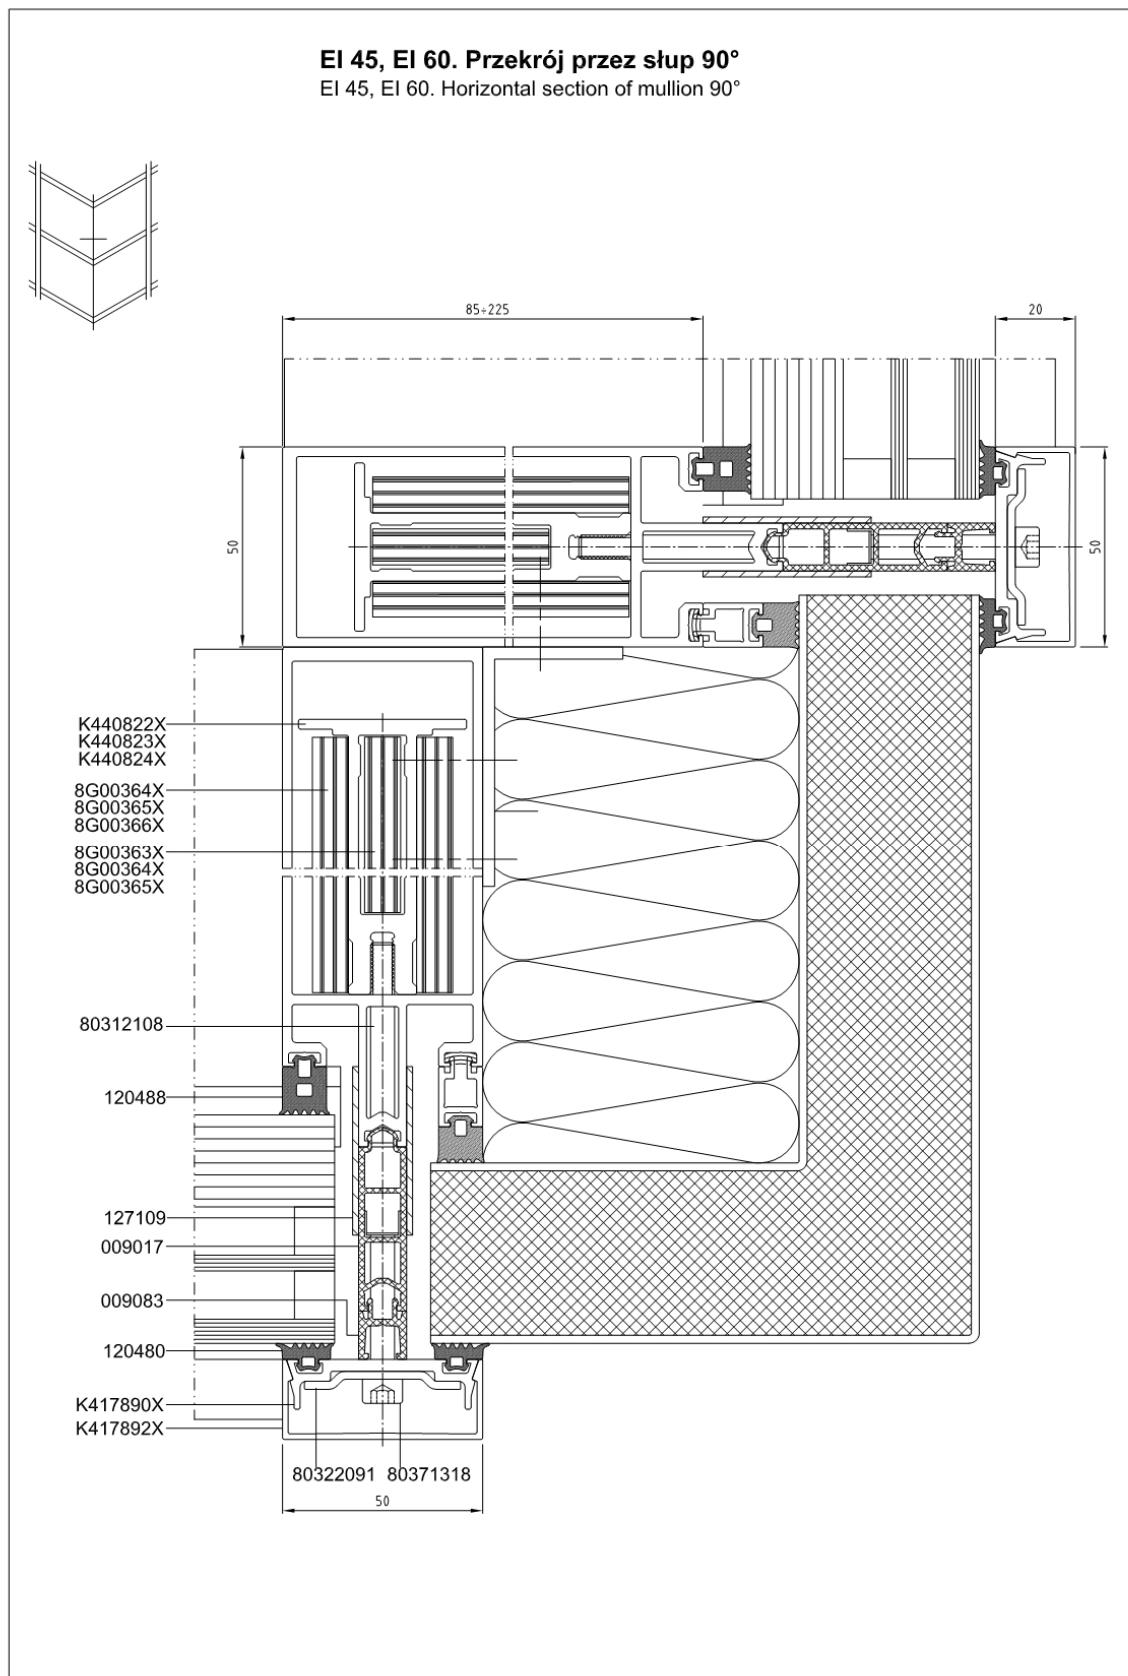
Typical cross-section through the corner of MB-SR50N EI EI60 system curtain wall
